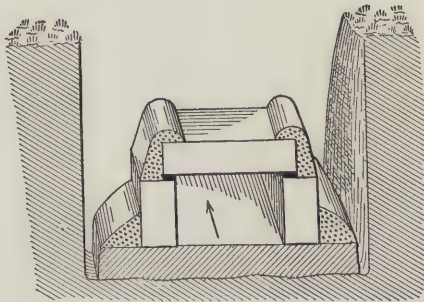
HOUSE SEWER MADE OF ROCK, BRICK AND CEMENT
